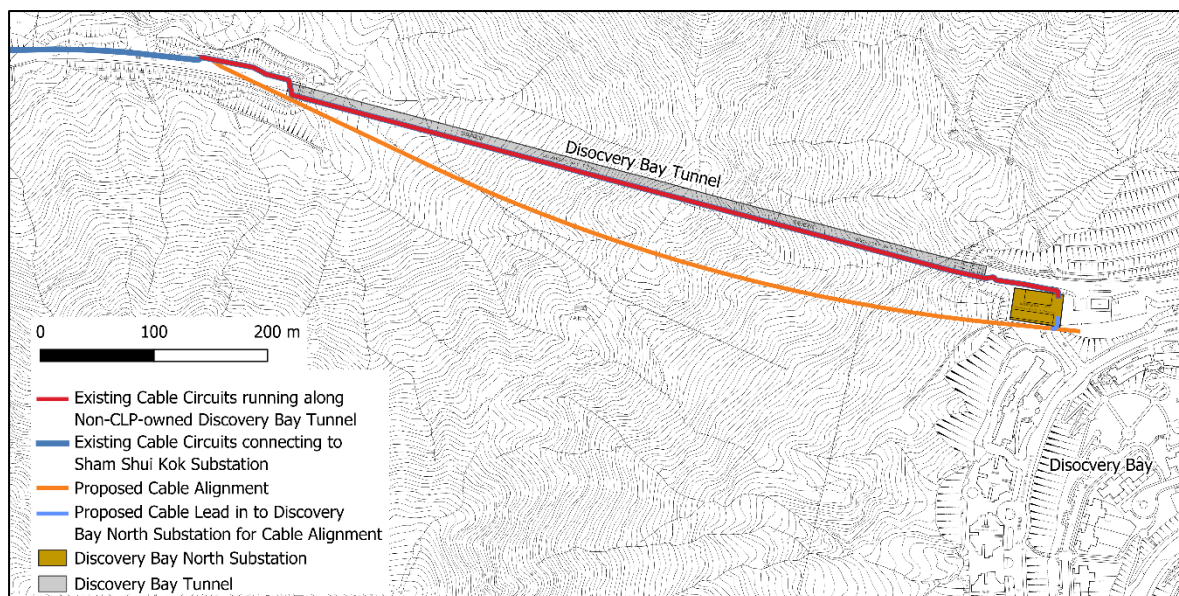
Existing Sections and Proposed New Cable Circuits running along Discovery Bay Tunnel
